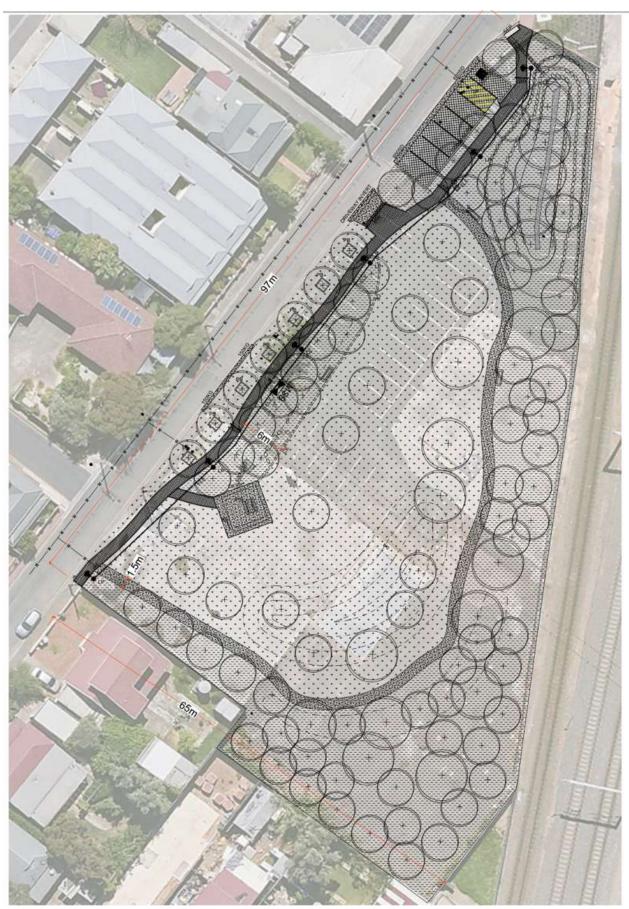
Drayton Street, Bowden, final Concept Plan.
